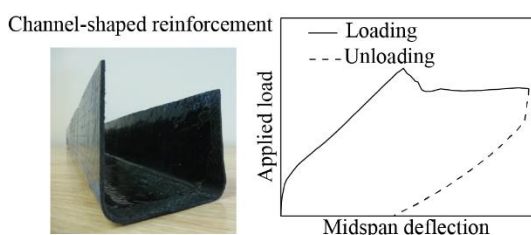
Load-deflection and failure behaviour of CFRP channel reinforced concrete beam
